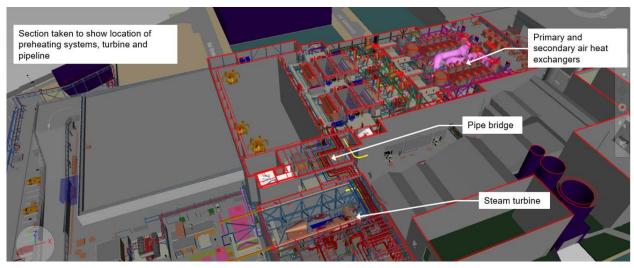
3D Model Section View of Consented Development with external pipework and pipe supports (Note – Proposed Project external pipework is coloured blue)
